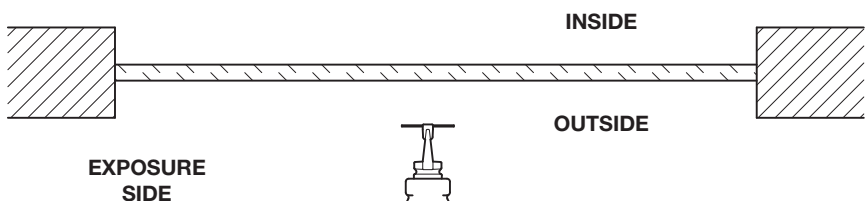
A-3 - EXTERIOR FIRE SEPARATION - SPRINKLERS OUTSIDE
